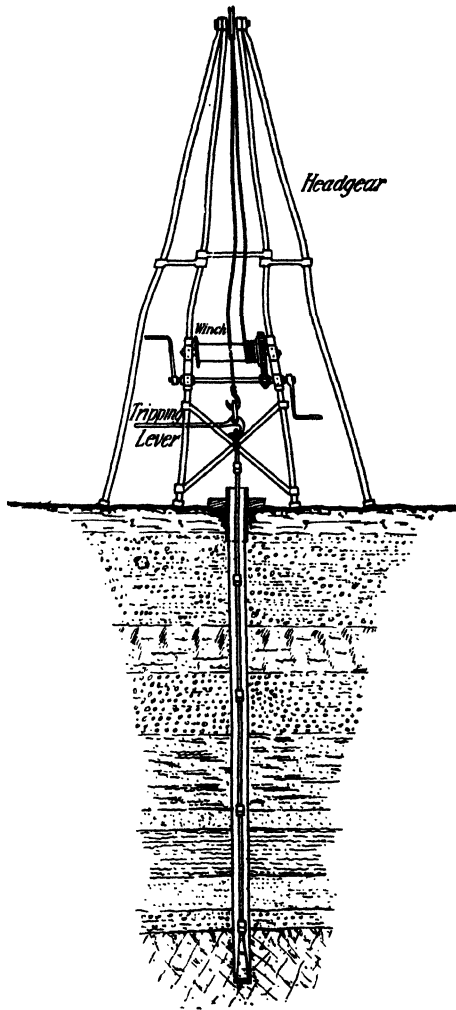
Percussive Boring, Hand Plant with Tube Headgear.
